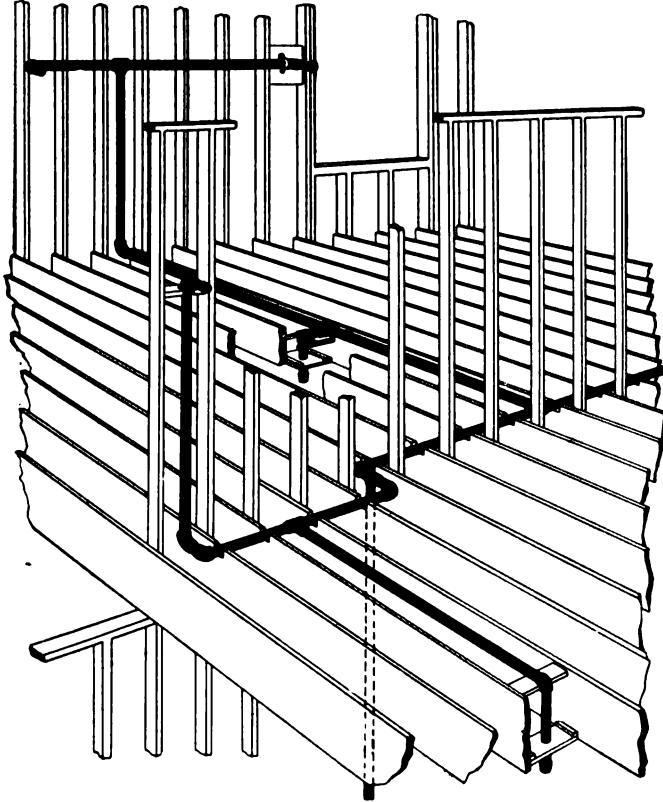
Lines of Gaspipe in Frame Building. Showing How Pipes are Secured in Place.
